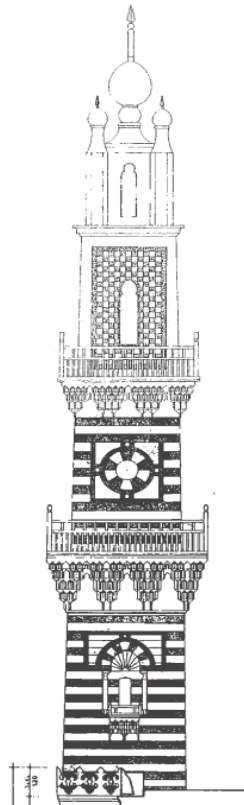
, a vertical section of the Qanibai Al-Ramah Minaret, quoting the foundations of architectural design and urban planning .
